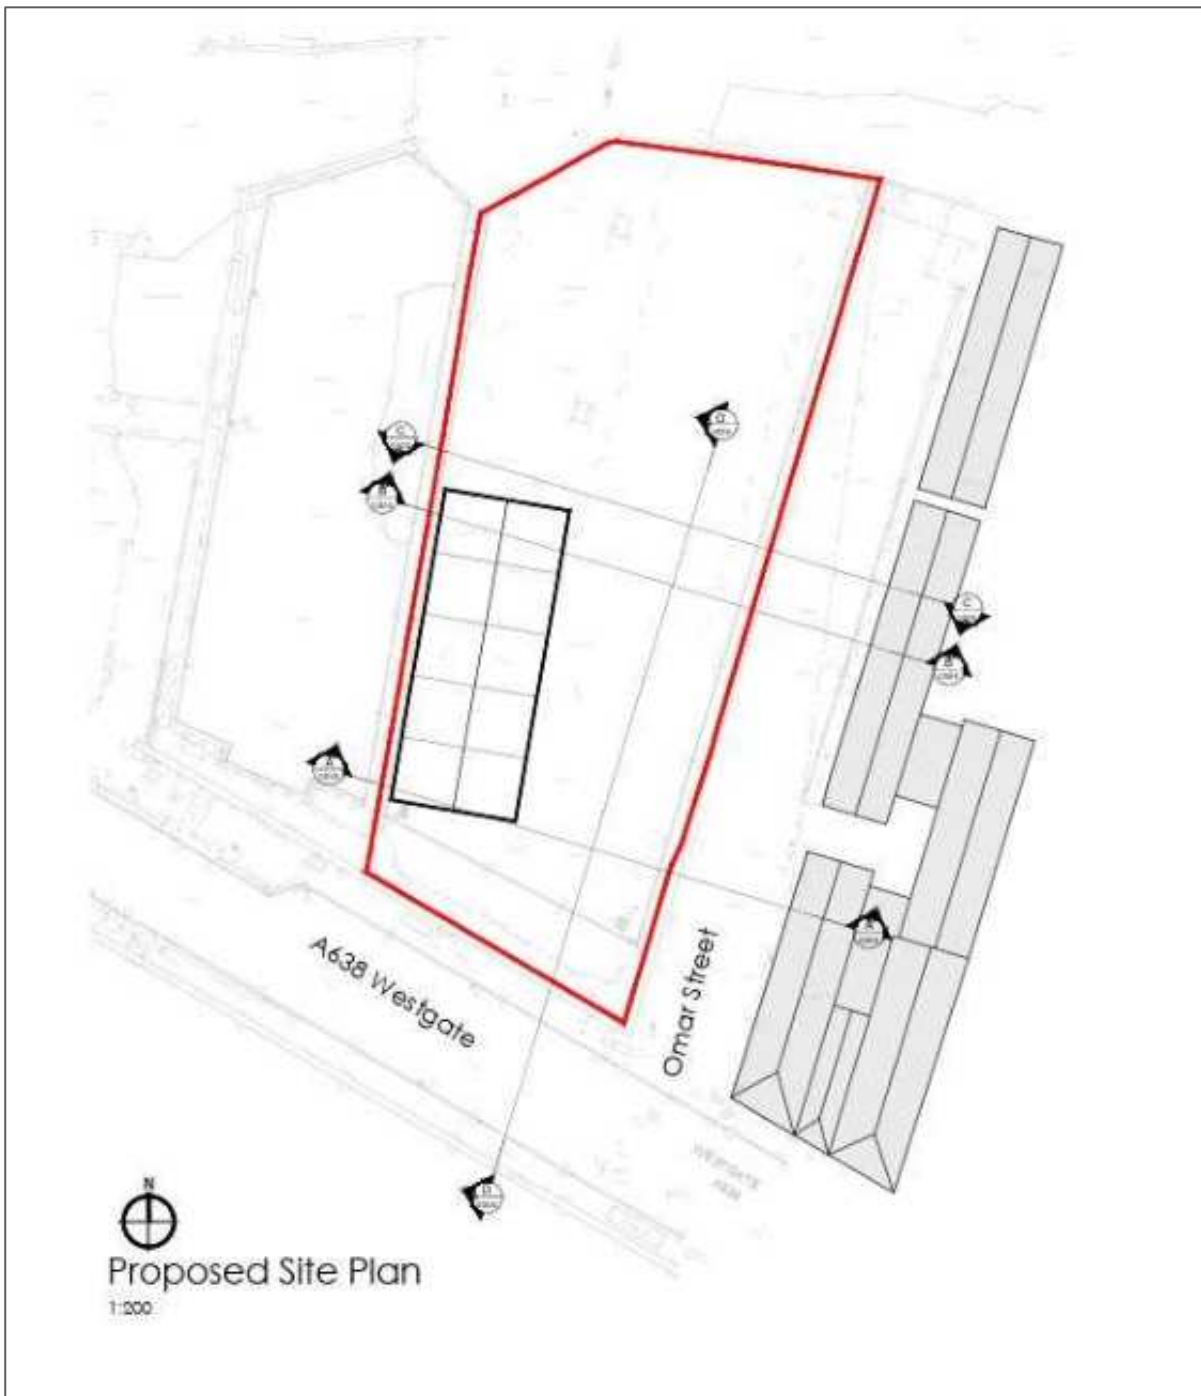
Proposed site layout – Application Boundary (0.172 Ha / 0.426 acres)
